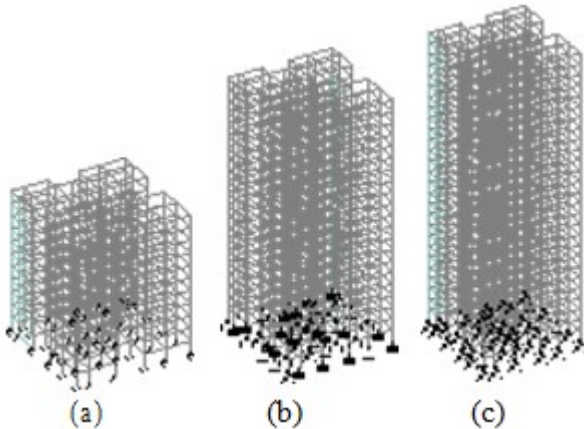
(a), (b) & (c) G+10, G+20 & G+26 RCC Shear Wall Structure with fixed support (Let us assumed as foundation of column)
